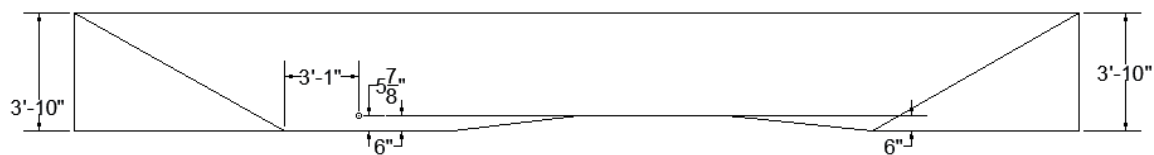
Plan view design drawing of LHPS flume (J-U-B Engineers 2014)
